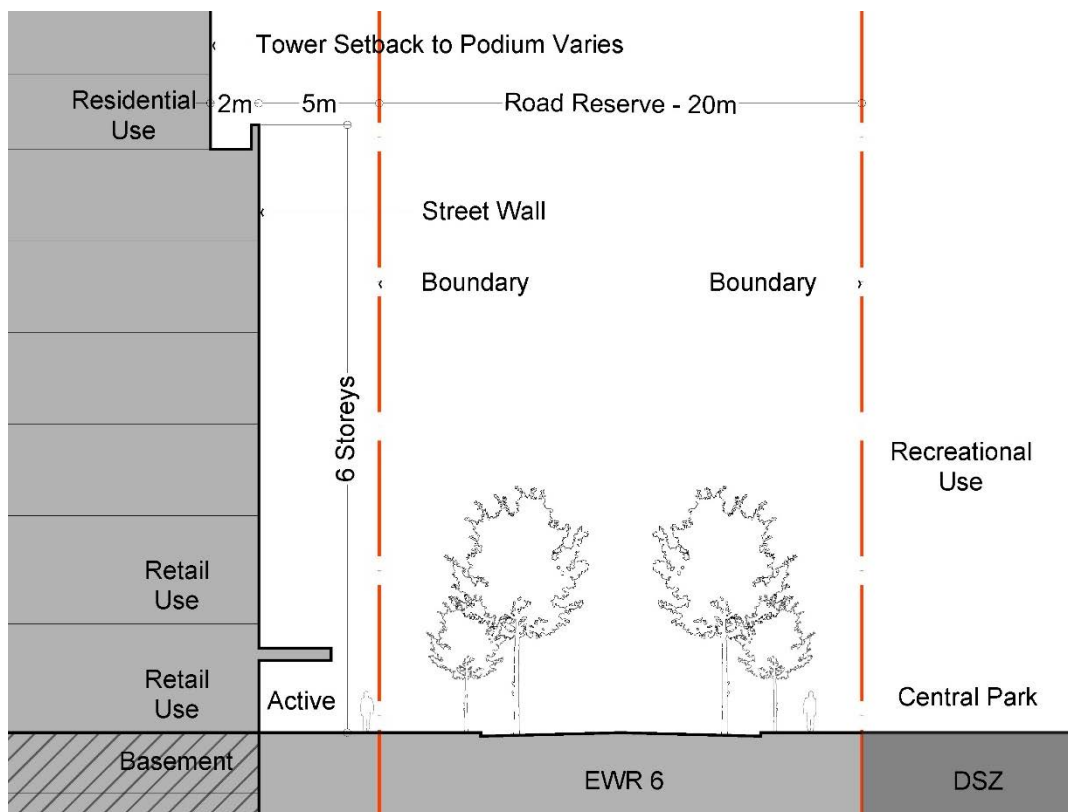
Street Wall Height in Town Centre
